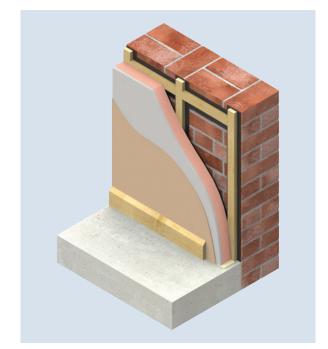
Kingspan* Kooltherm[®] K118 Insulated Plasterboard installed with Mechanically Fixed Timber Framing System
